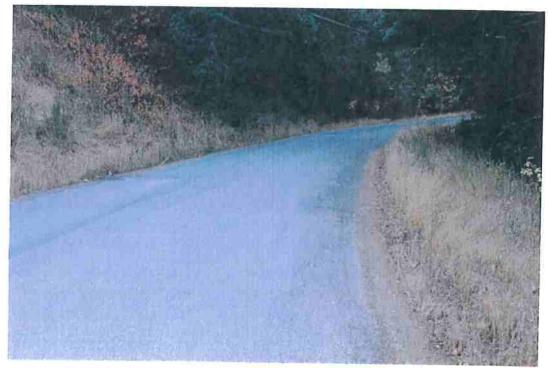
Mile 1.3: 22-ft road width with 2-ft shoulders.
